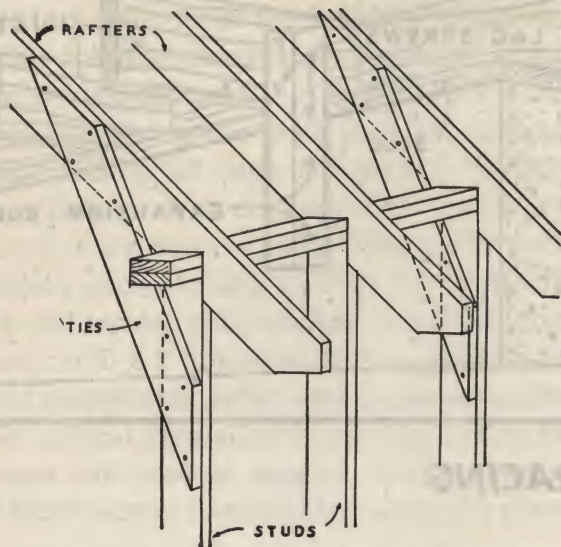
In buildings without cross ties at the plate line, rafters should be tied to sidewalls with braces.
